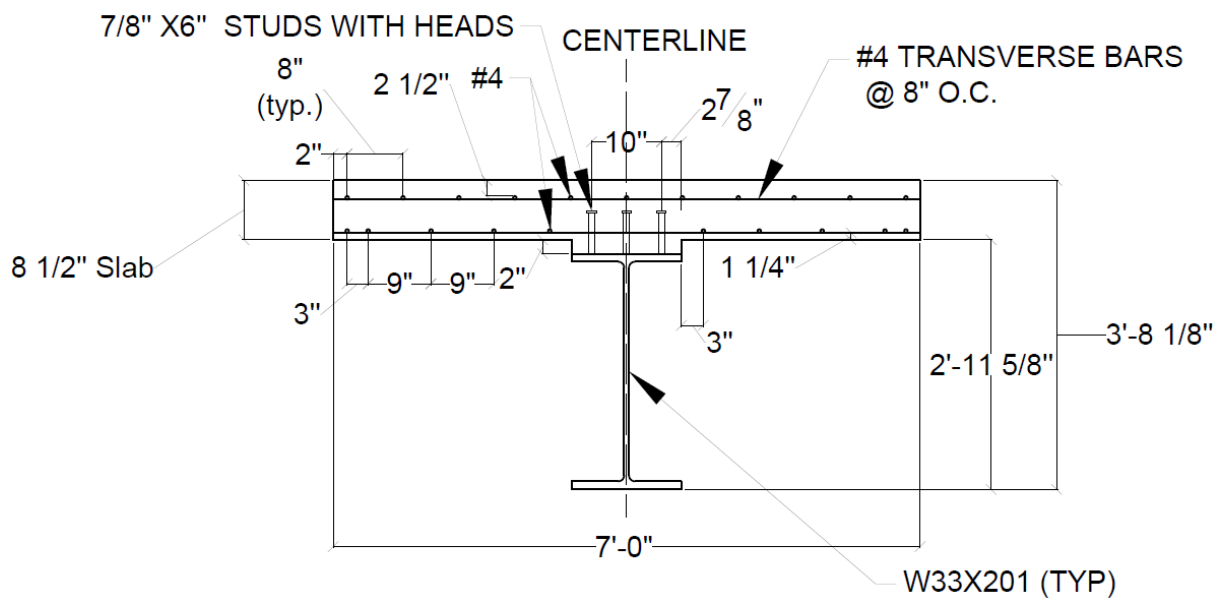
Composite Section of Steel Beam and Concrete Slab.
